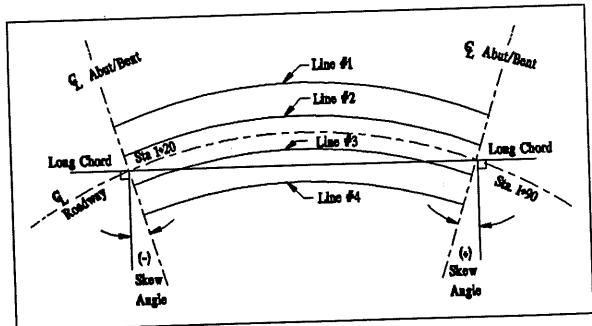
Geometry for Curved Girder Bridge - Skew to Long Chord
